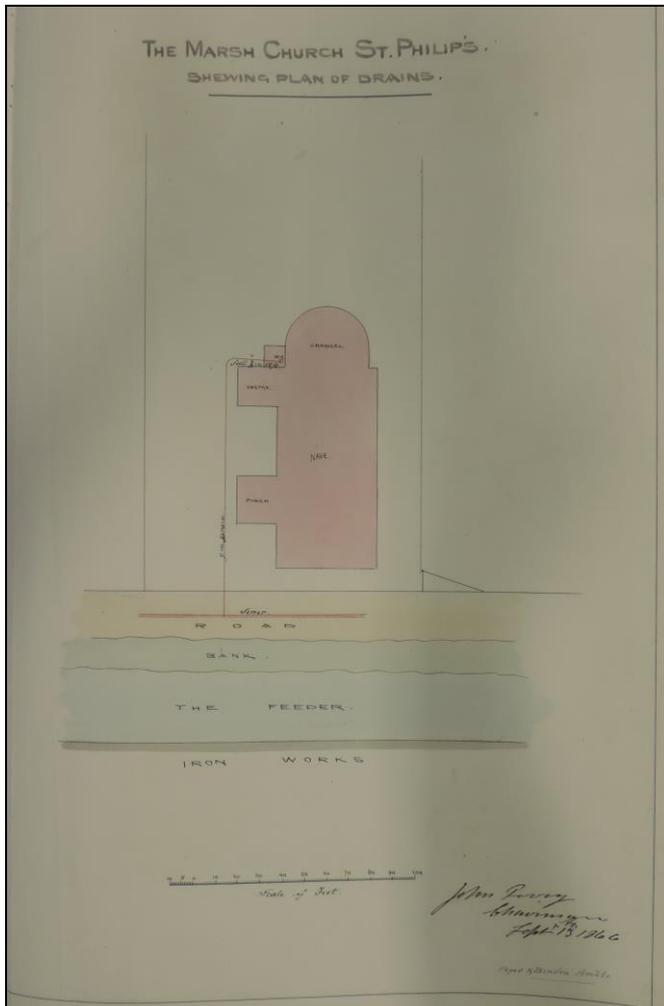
Architects Plan of the first St Silas' Parish Church dated 1866 by Popes and Bindon Architects. Bristol Record Office Ref Building Plan/Volume7/89a
